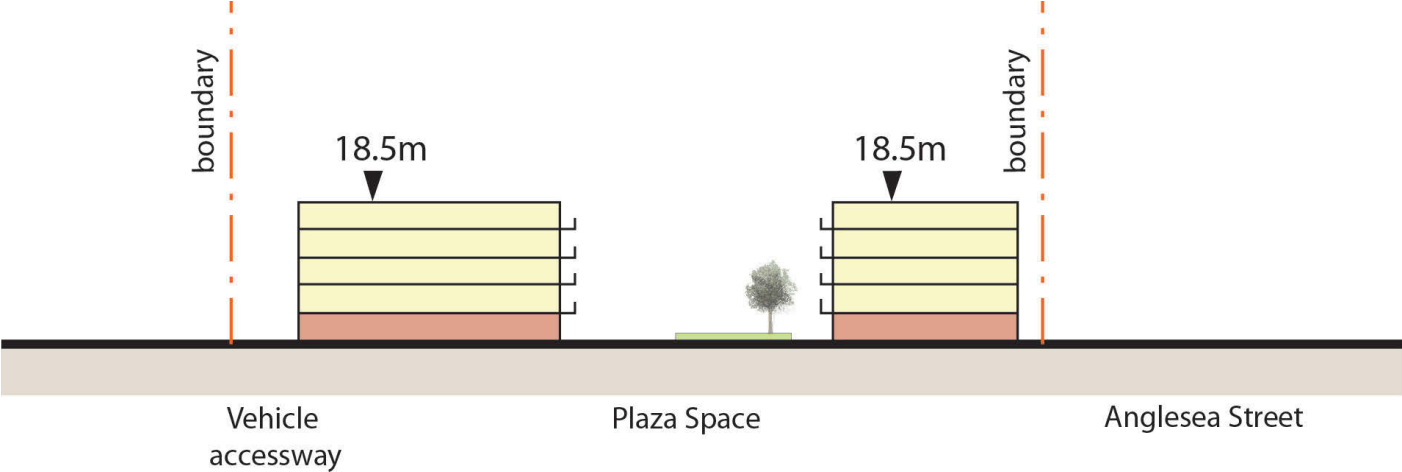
Indicative concept section A-A for Development Site 1 (not to scale)
